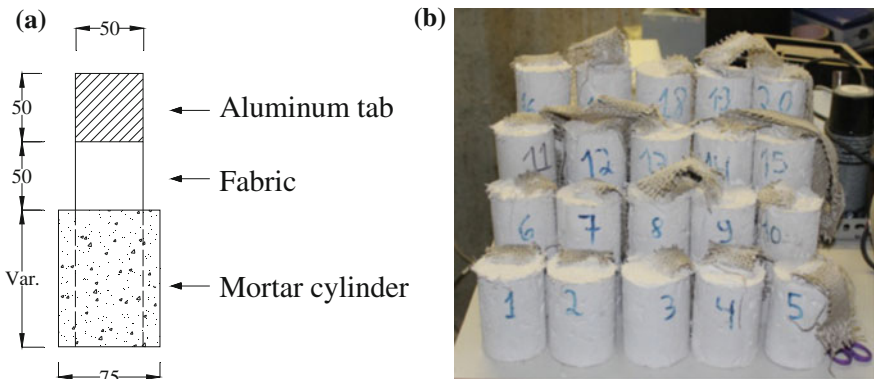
Pull-out test specimens: a geometrical details; b specimens
